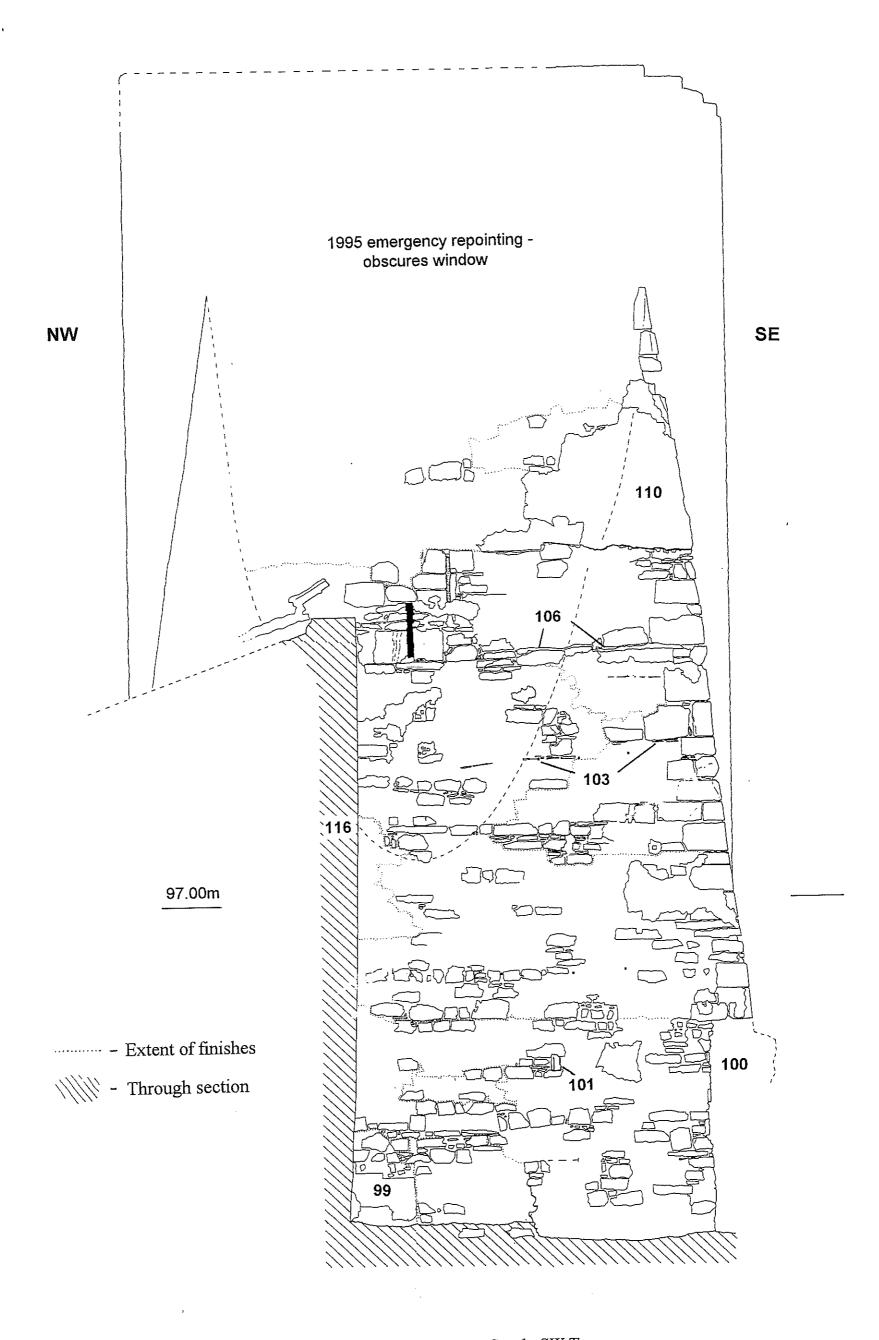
Carmarthen Castle SW Tower: South-west external elevation
